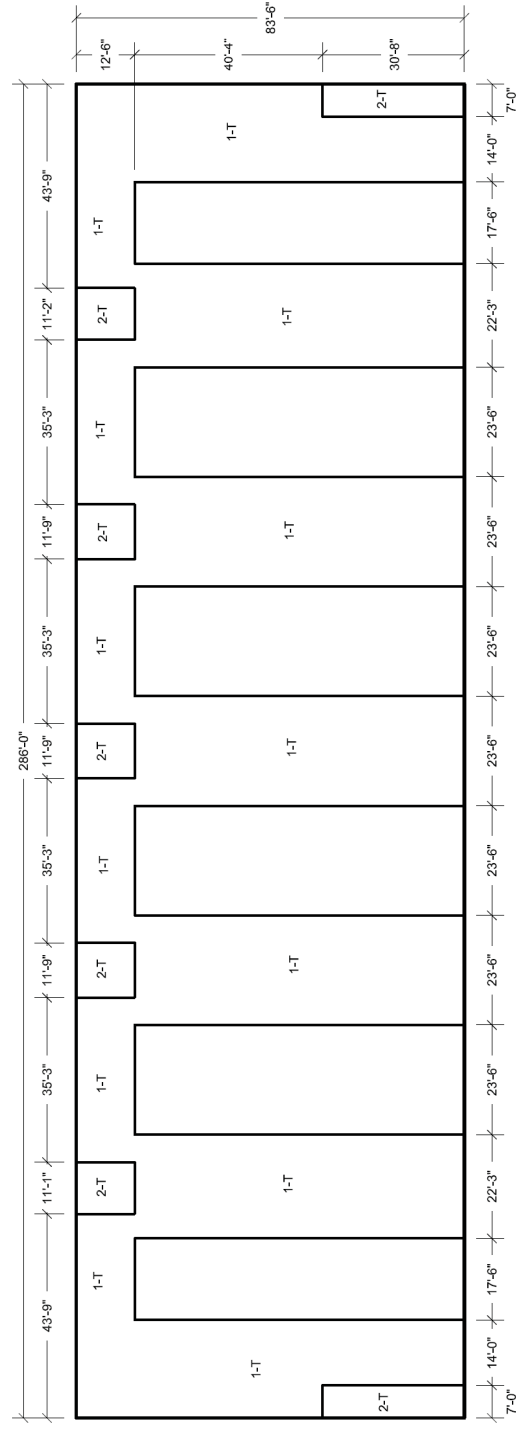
H.6-90: UHS BASIN SOUTH WALL LOOKING NORTH
